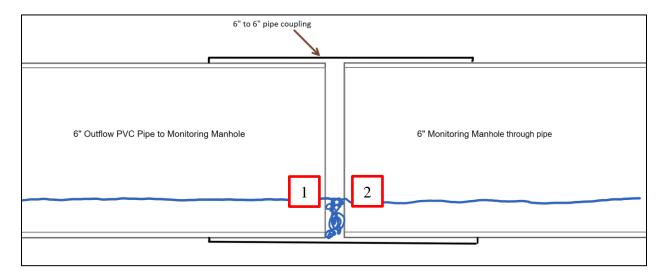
6" Coupling of 6" Outflow pipe to 6" monitoring manhole through pipe
